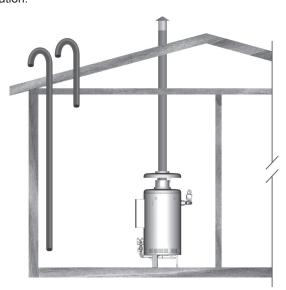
OUTDOOR AIR THROUGH TWO VERTICAL DUCTS
